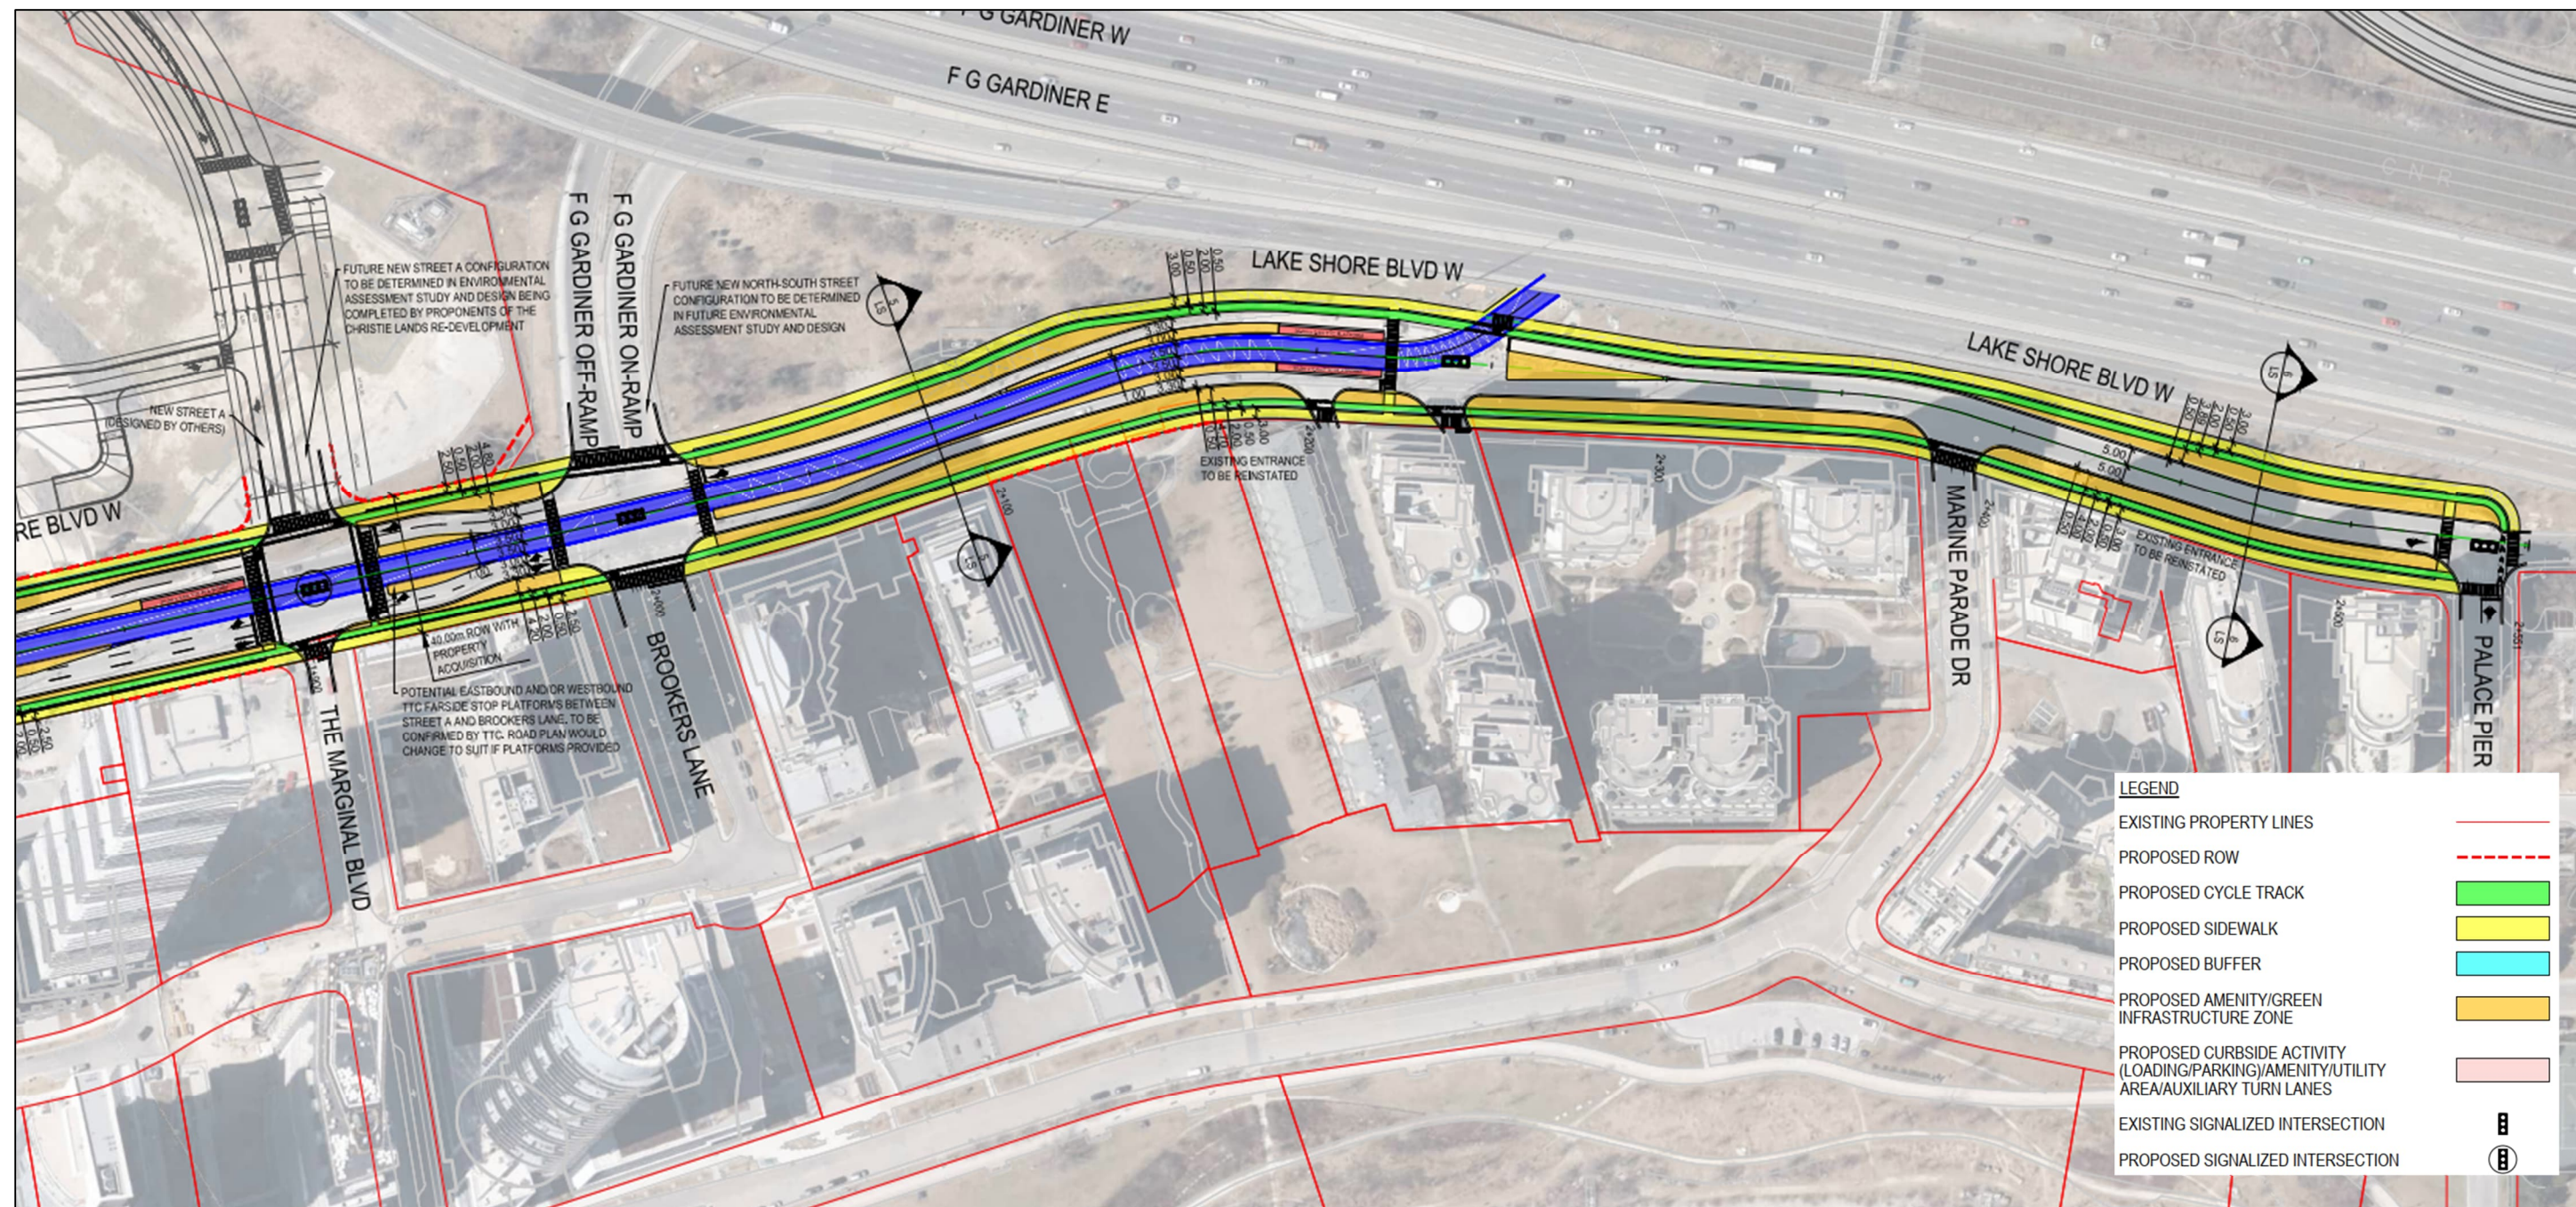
Functional Design Plan – Lake Shore Boulevard West
